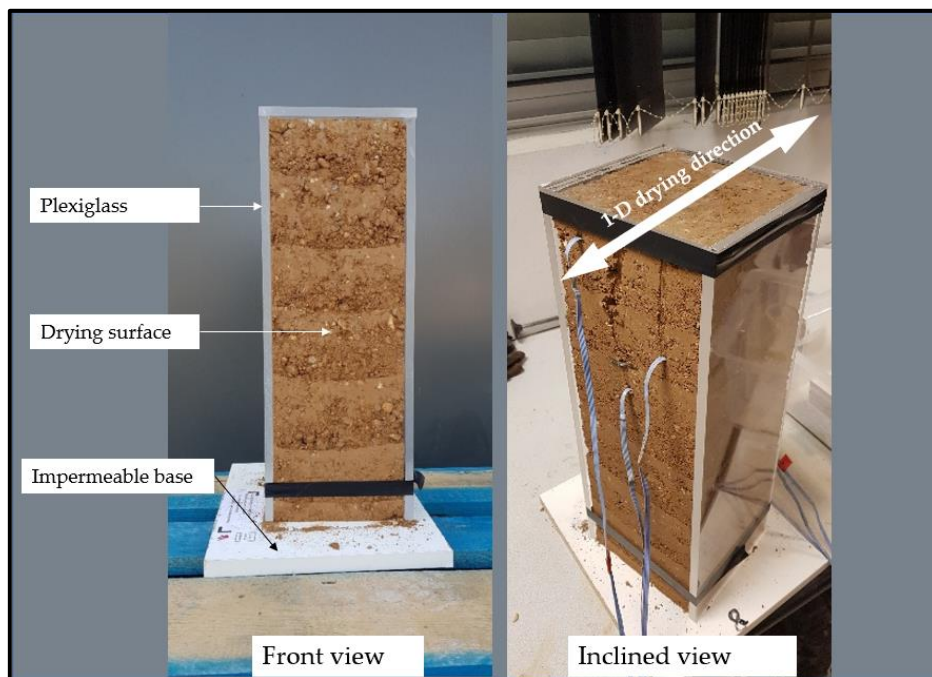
Rammed earth samples covered by plexiglass to allow drying on one direction.
